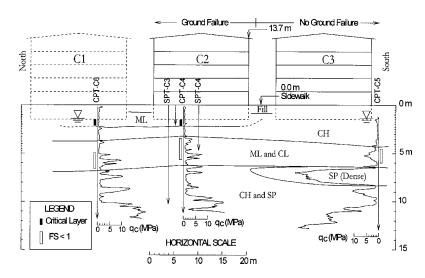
North to south generalized soil profile of Site C (cross section A-A' in Fig. 4)
